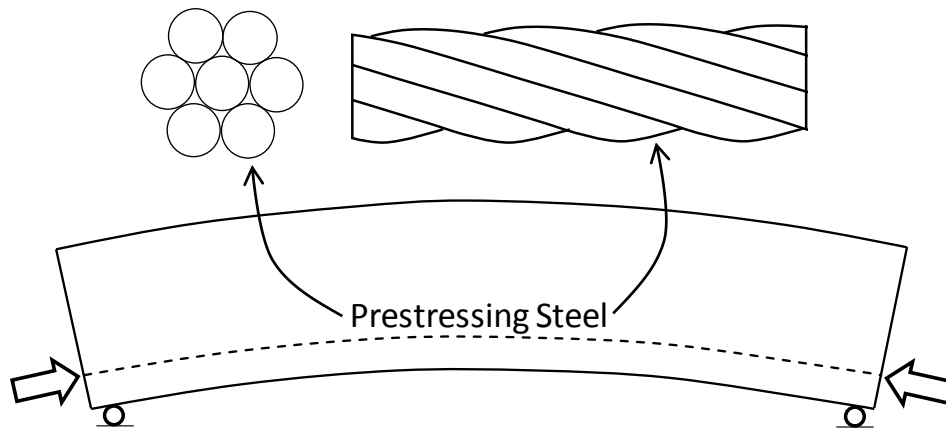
Behavior of simply-supported prestressed concrete beam
